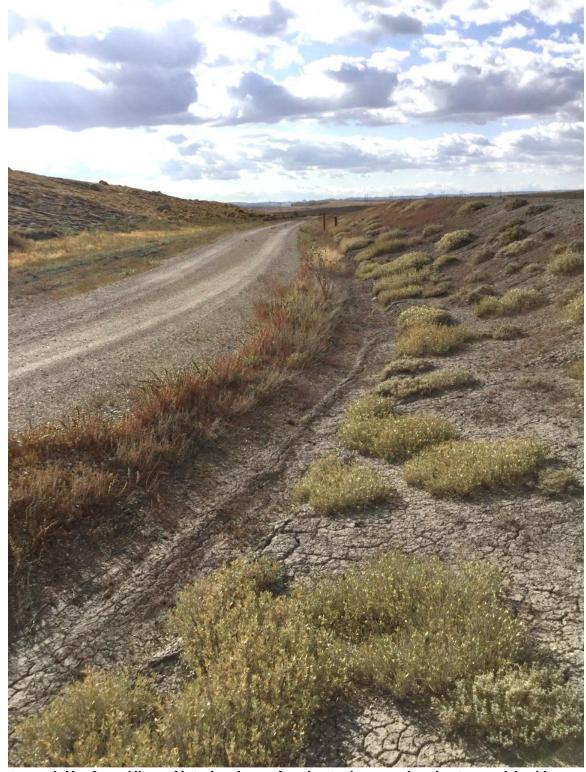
View of west slope of CCR Landfill and onsite runoff collection ditch running along the toe of the slope, looking southeast.
